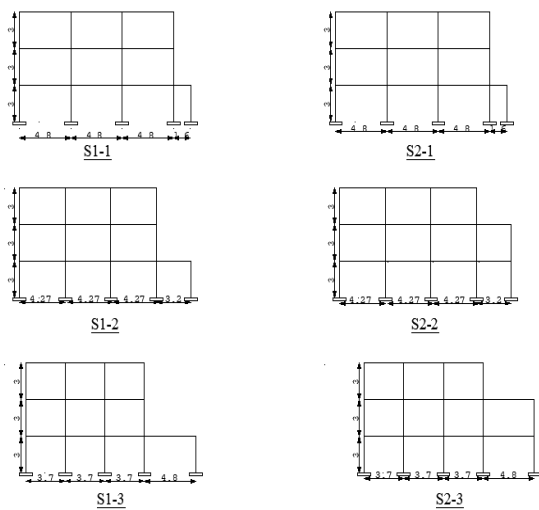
X-Z plan view of the studied construction models with vertical geometric irregularity
